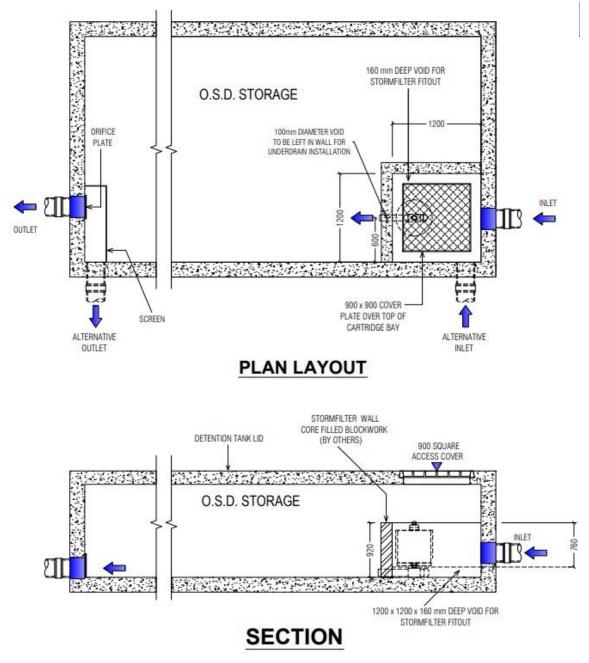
Typical Plan and Section of combined OSD and StormFilter Unit (Source: Ocean Protect)
